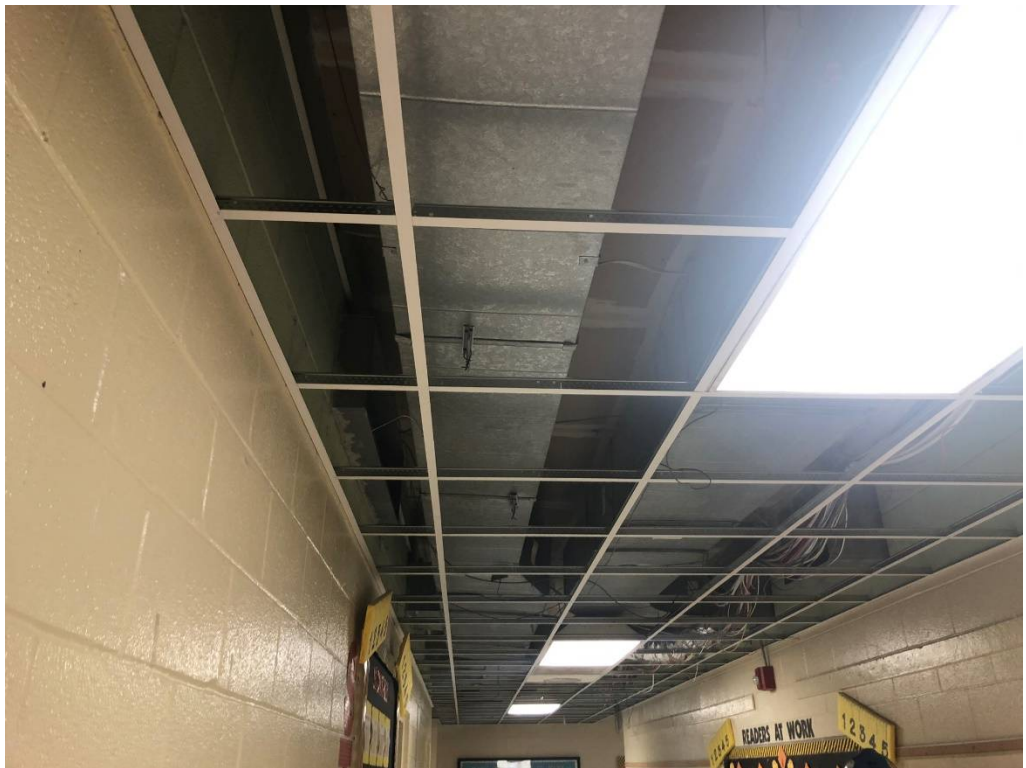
Connecting Hall @ Double Door Looking South Near Teacher's Workroom
